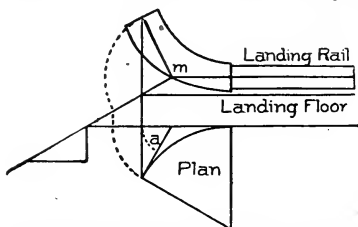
Development of Face-Moulds for Plan, Fig. 137.
